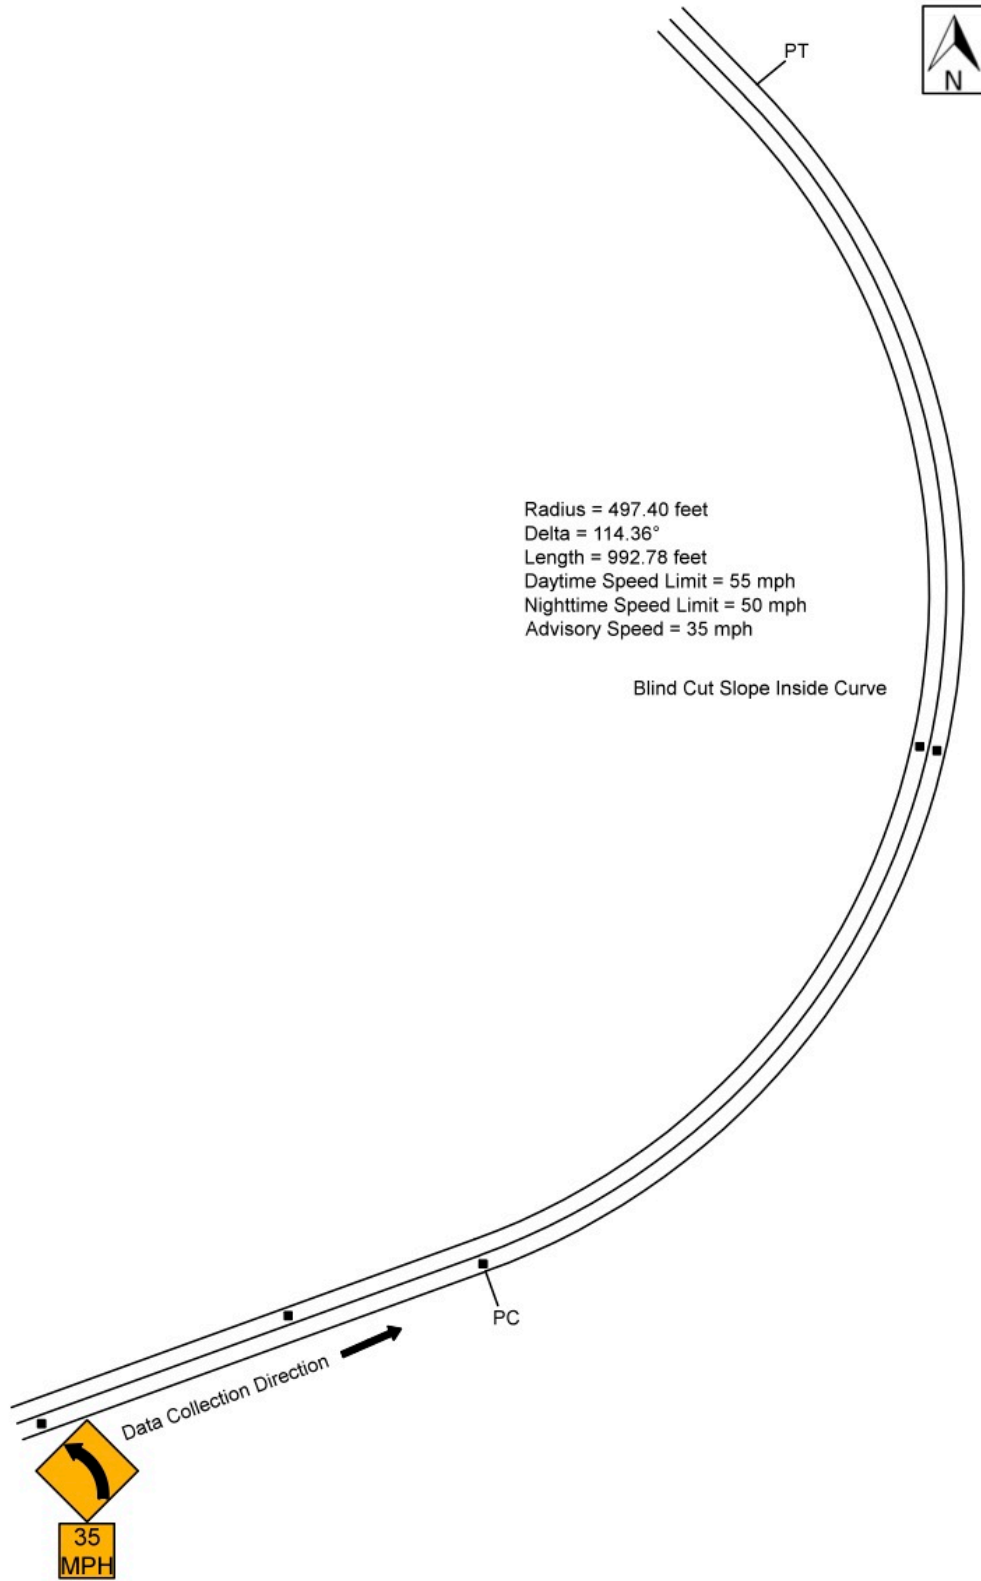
Diagram. Geometric layout of northbound Pierce Ferry Road (not to scale).
